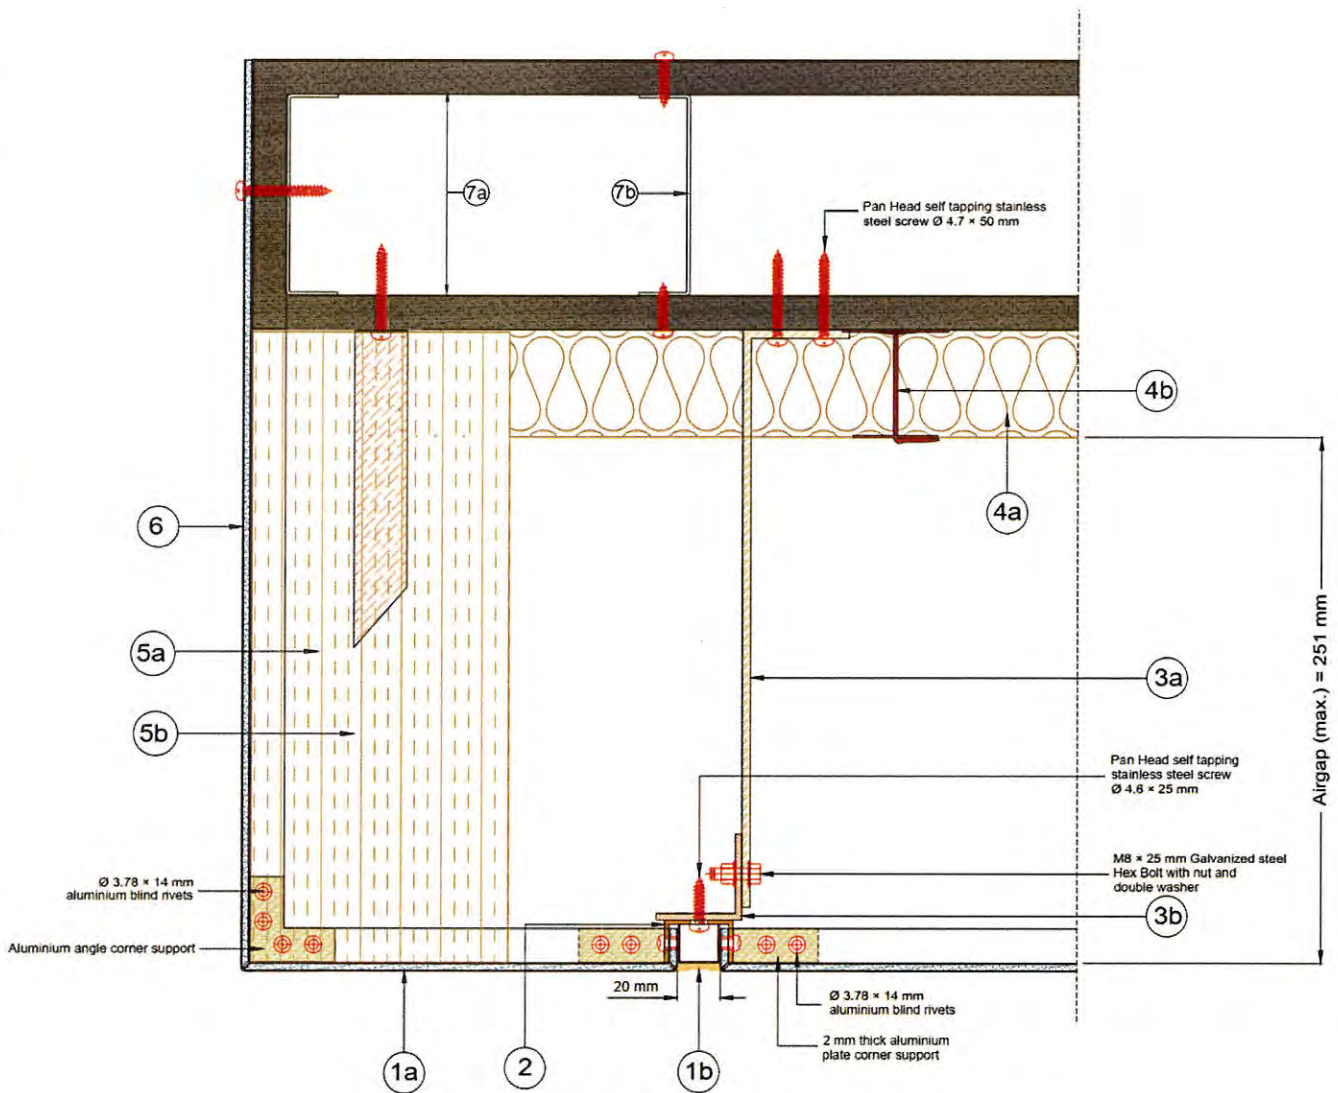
"Emerge U.K. FR A2" 4 mm thick Aluminium Composite Material Exterior Wall Cladding Assembly horizontal window section details
